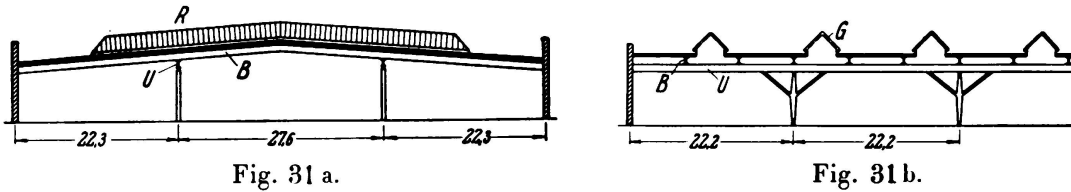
Tram car shed, Bochum, a cross section, b longitudinal section
